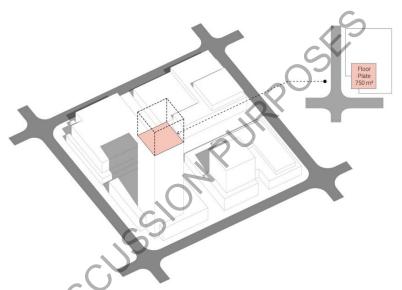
Maximum floor plate size of 750  $m^2$  for point tower high-rise buildings (excluding balconies).
